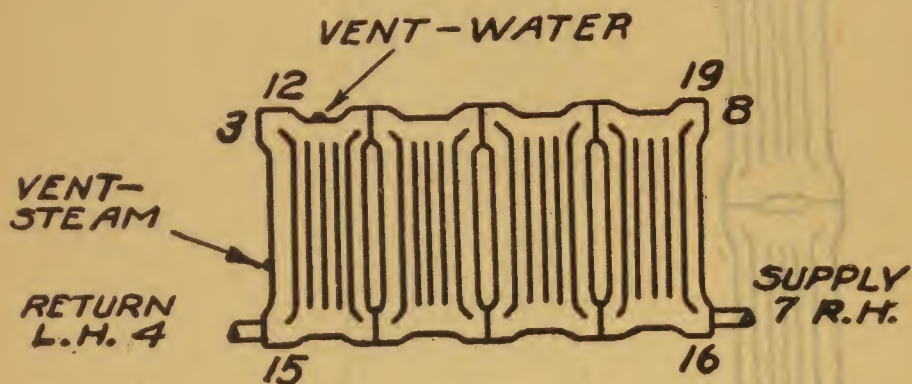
Assembled in single tier. For water, one or two pipe steam.
